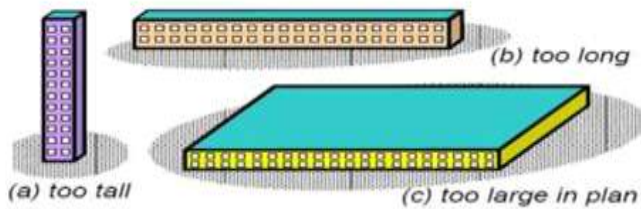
Buildings with one of their overall sizes much larger or much smaller than the other two sizes (Courtesy: CVR Murty)
